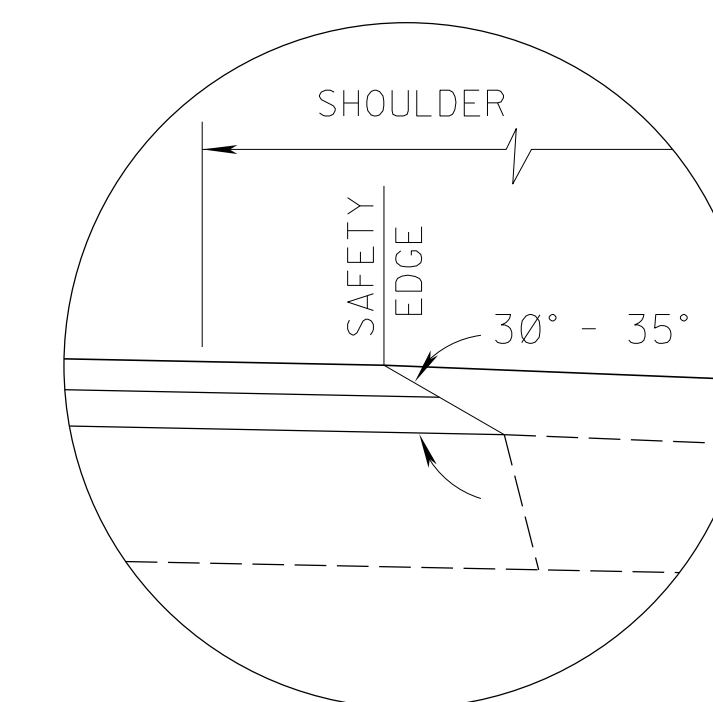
DETAIL FOR LOCAL ROAD TURNOUTS, MILLED SECTION.
